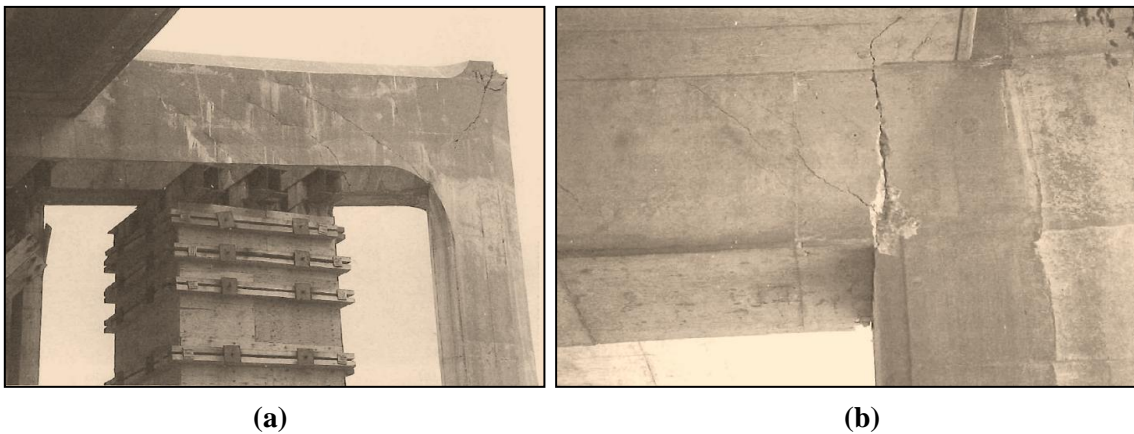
a) Abutment slumping and rotation failure, Rio Bananito bridge, 1990 Costa Rica earthquake⁴; b) Cap beam positive moment cracks at inner column face, 1989 Loma Prieta earthquake [7]
